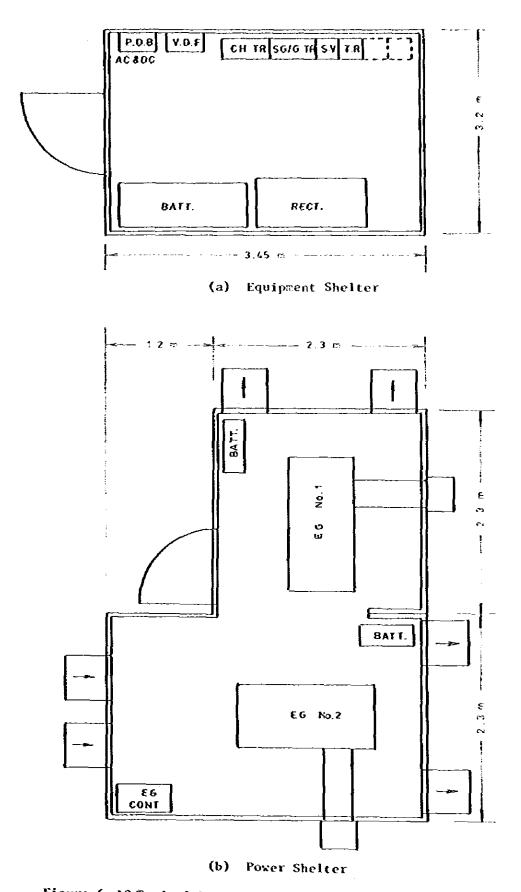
Typical Equipment Floor Layout for Terrestrial System
